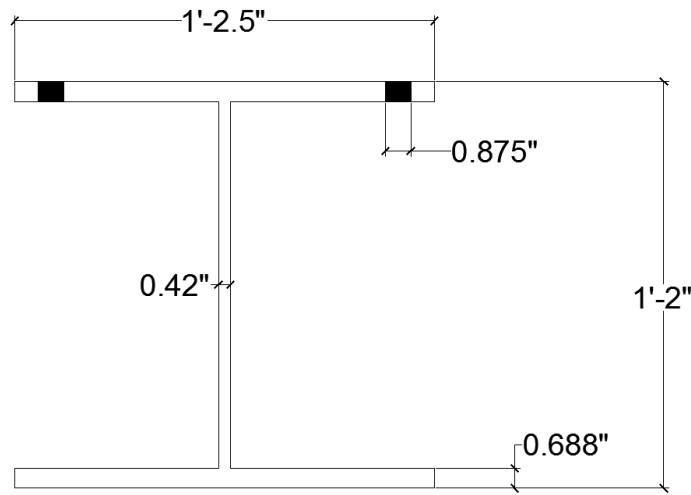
W14x87 Cross-section with holes drilled out on top flange
